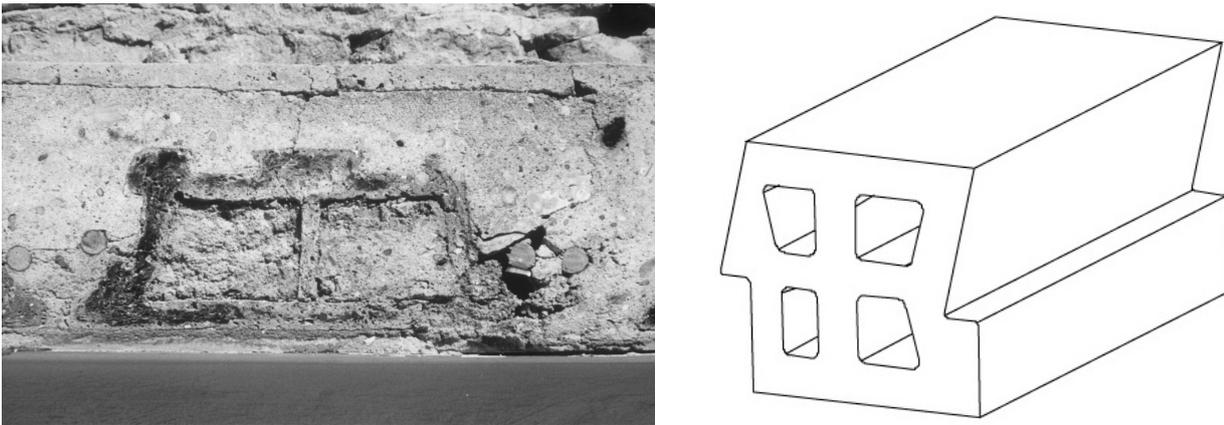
(left): Cross section of a typical reinforced brick floor from about 1910 showing brick, concrete and reinforcement steel; Figure 2 (right): Clay bricks fitted with grooves and springs
